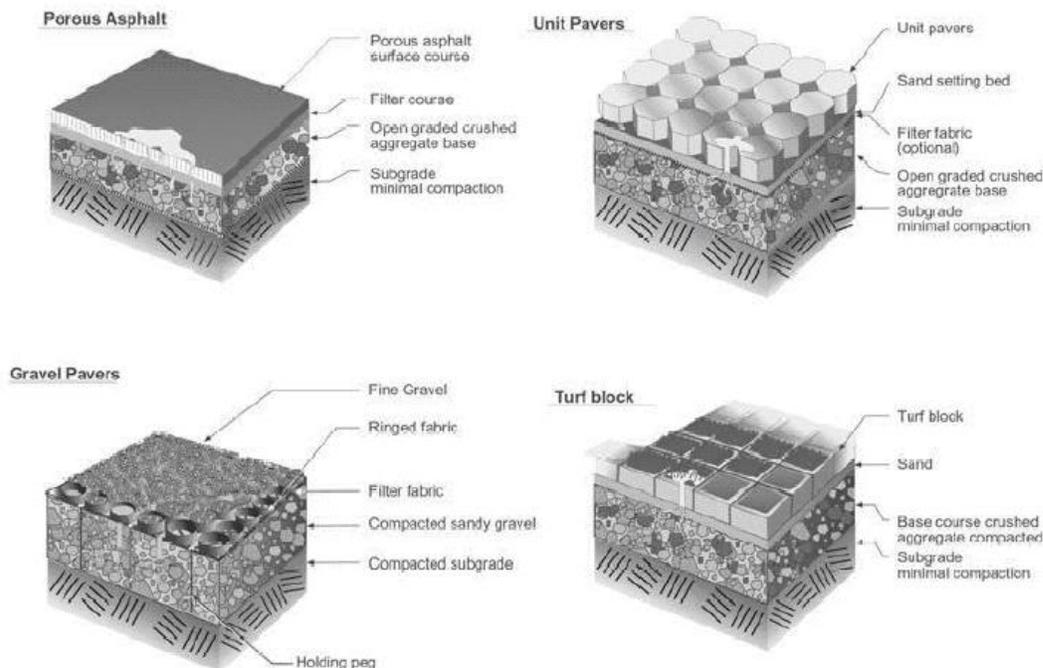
Cross-sections of Typical Porous Pavement Installations and Different Types of Porous Pavement (from Sacramento 2000)
